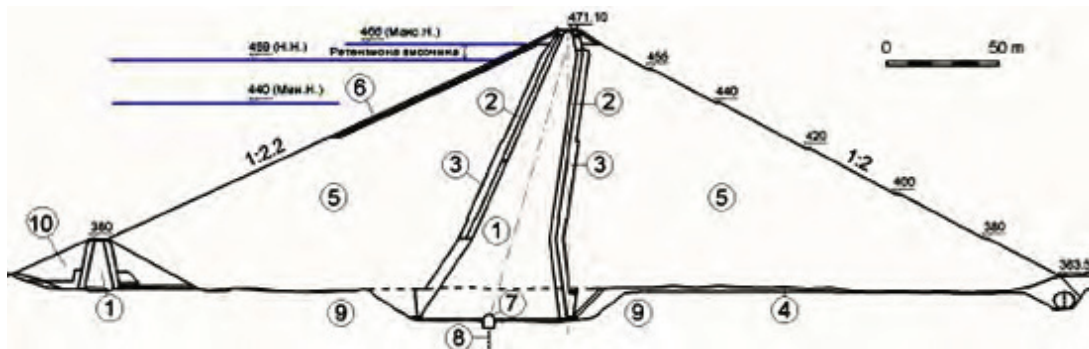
Main cross-section of Kozjak Dam, section no. 17. (1) Clay core; (2) first transition zone; (3) second transition zone; (4) river deposit; (5) rockfill shells (limestone); (6) arranged slope protective stones; (7) grouting gallery; (8) grout curtain; (9) rock foundation (limestone); (10) gravel in the upstream cofferdam.
